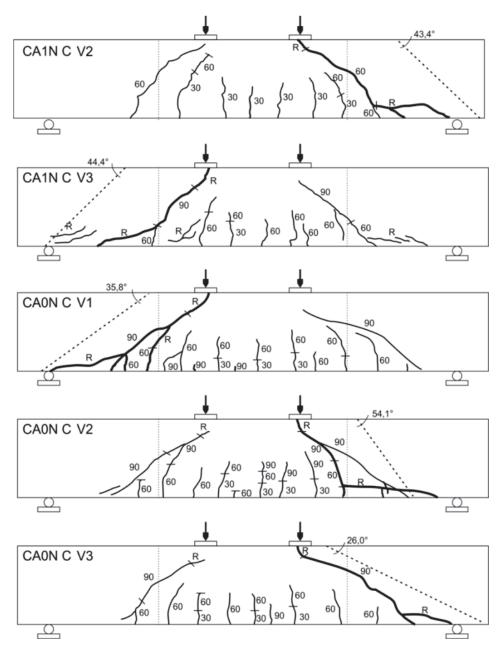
Crack patterns of self consolidating concrete beams with normal amount of coarse aggregate
